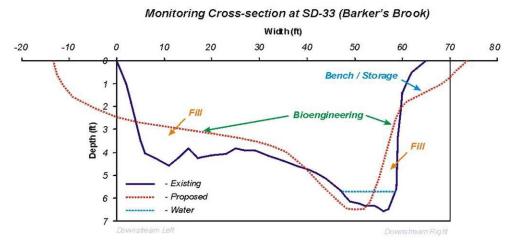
Proposed cross-section at location of existing Monitoring Site for Barkers Brook.
